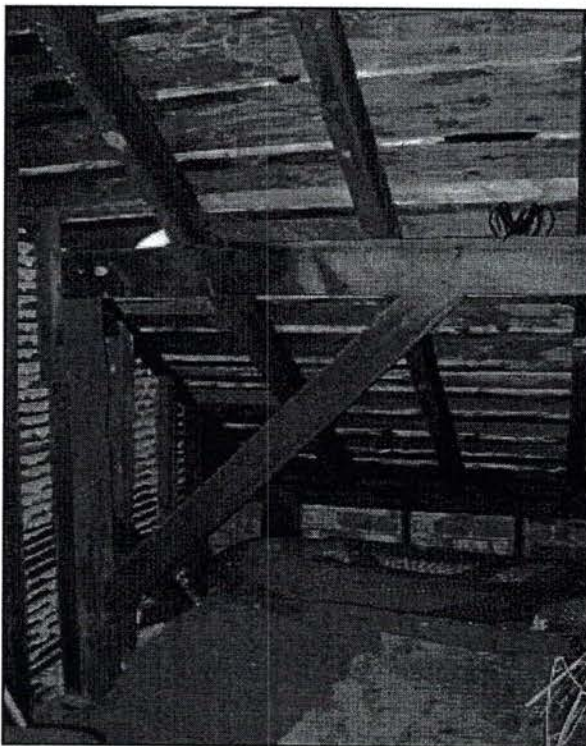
View looking towards the southern wall of the attic story of the 1861 structure showing roof bracing.
